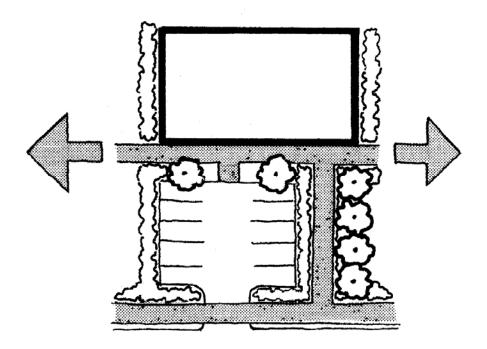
Landscaped walkways connect the public sidewalk with the entrance to a building set back from the street and also provide convenient access to neighboring properties, which encourages multiple-purpose trips.
